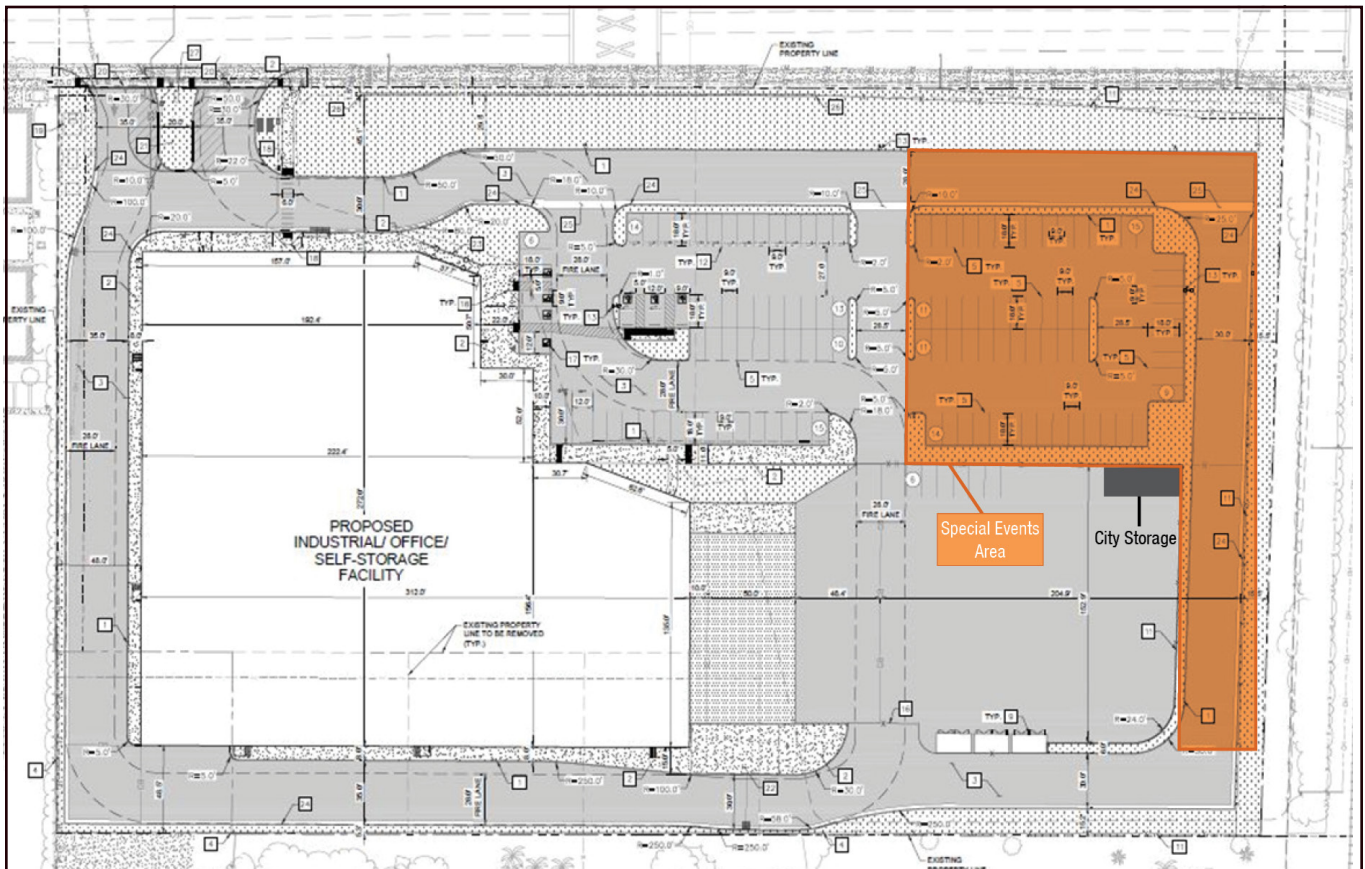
, Site Plan and Land Use Plan - Special Events with Circulation Buffer
